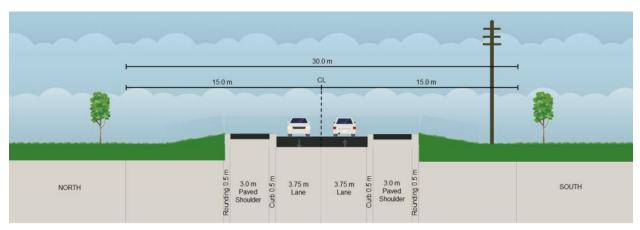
Sub-Section 2-3 – West to East Boundary of Lover's Creek PSW
